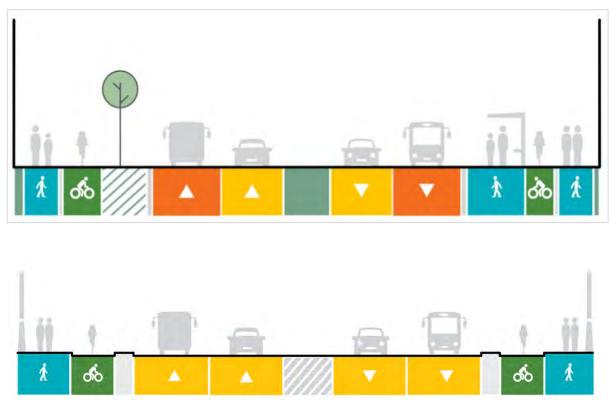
Māmari Road Upgrade Typical Cross Section – Corridor and Bridge
